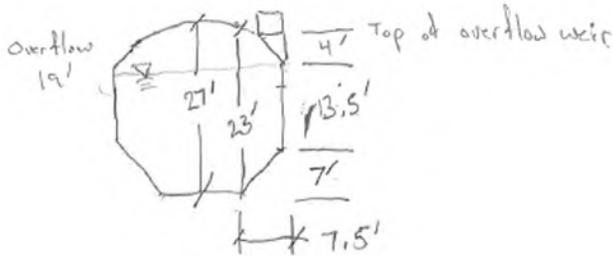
Reservoir INTERIOR WALL Elevation– Note location of ladders and other features.
